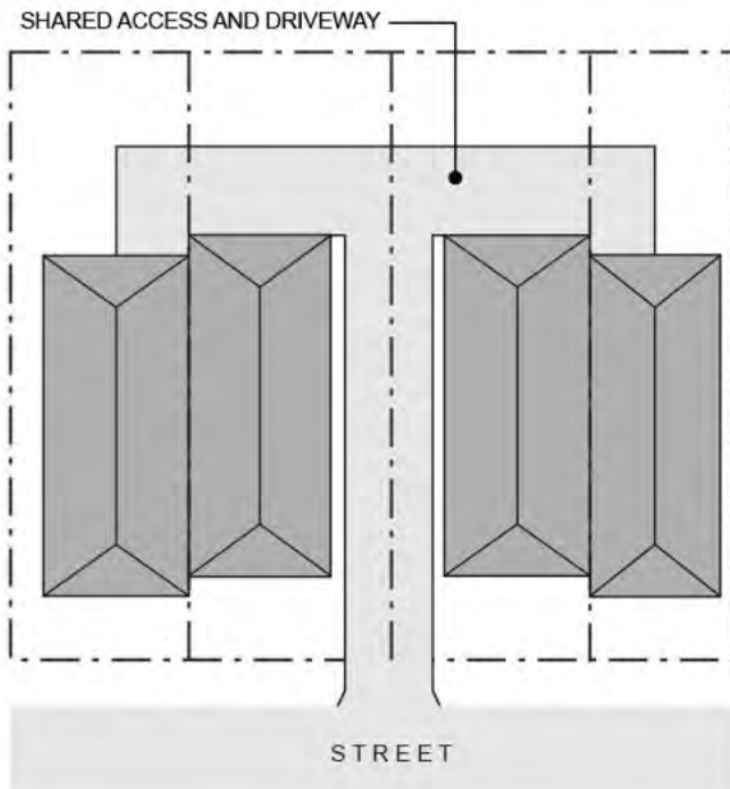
N. Townhouses on Corner Lot with Shared Access
